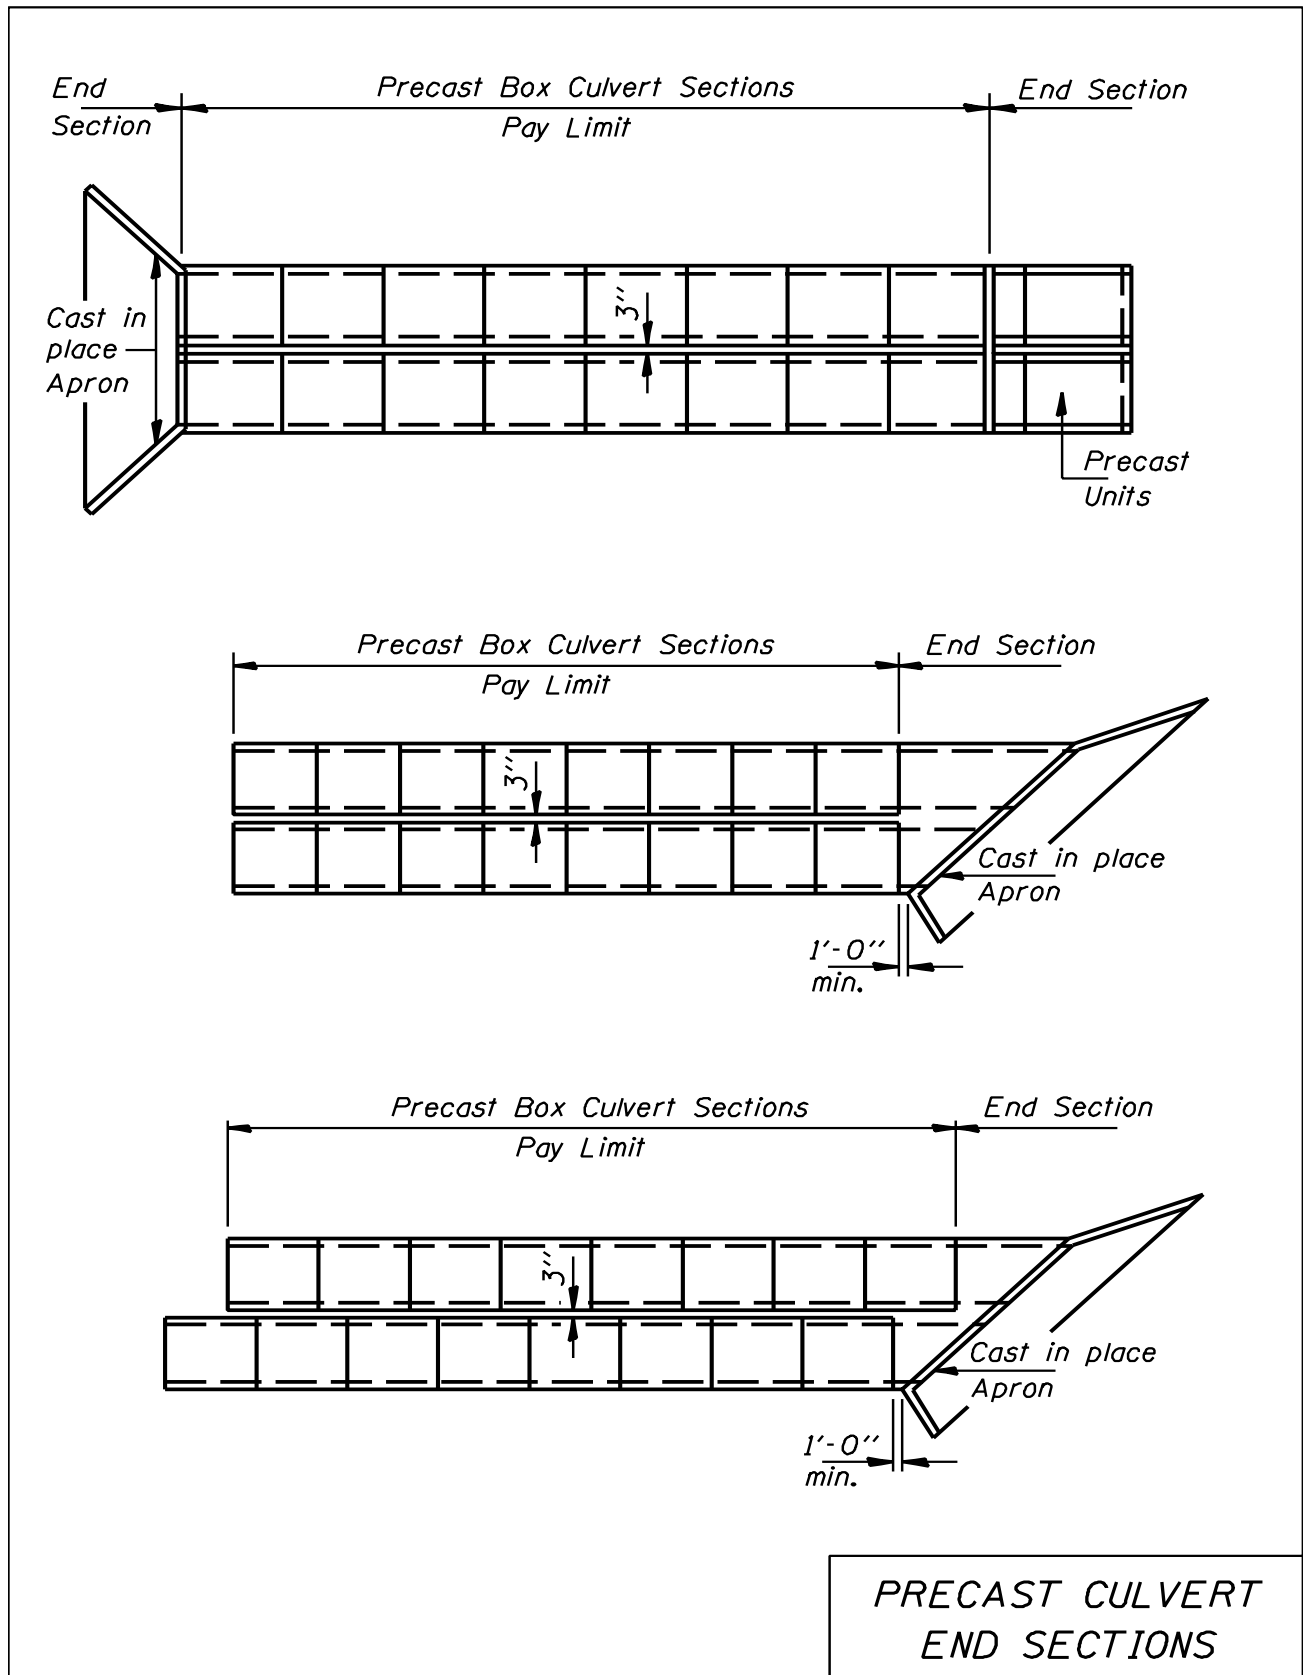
and 2.3.4-2 show the acceptable types of end sections that can be used for a precast box culvert. End sections may either be precast, if hydraulically acceptable, or cast-in-place.
